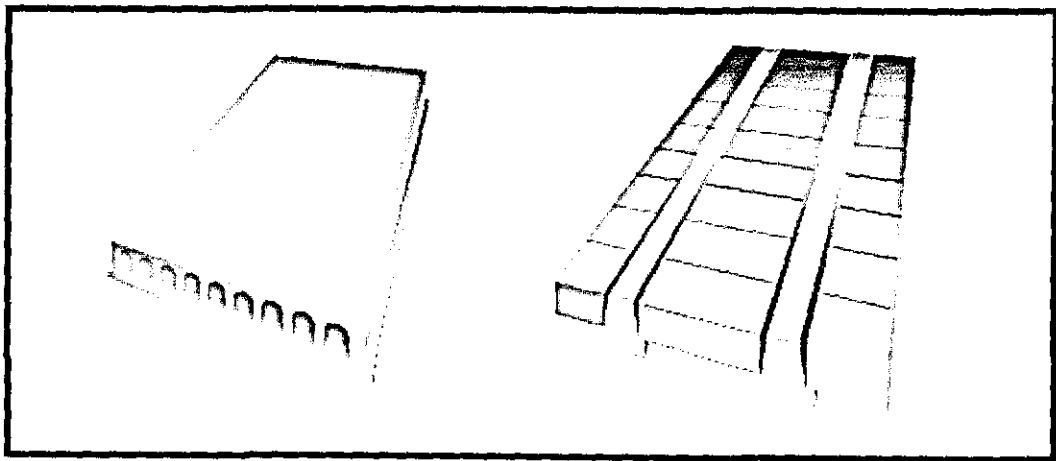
Concrete hollowcore slab (left) and precast prestressed beams and blocks (right).
